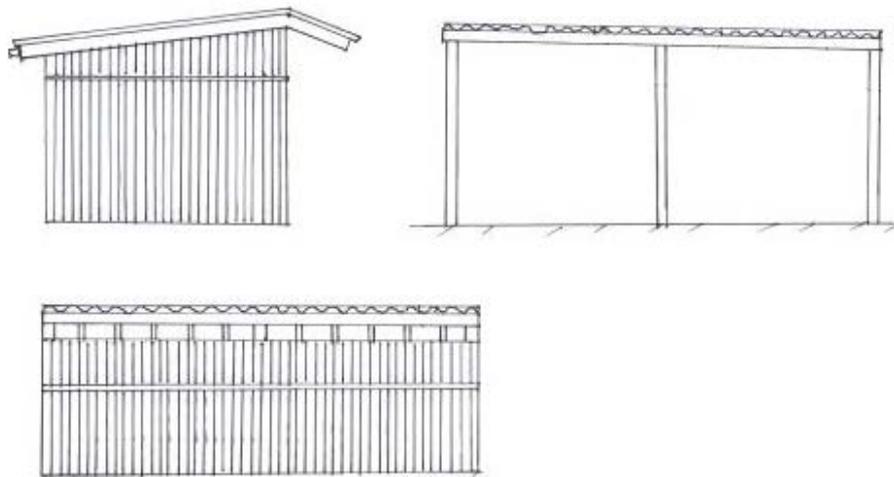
Side, front, and rear elevations of the horse shelter (not to scale)
